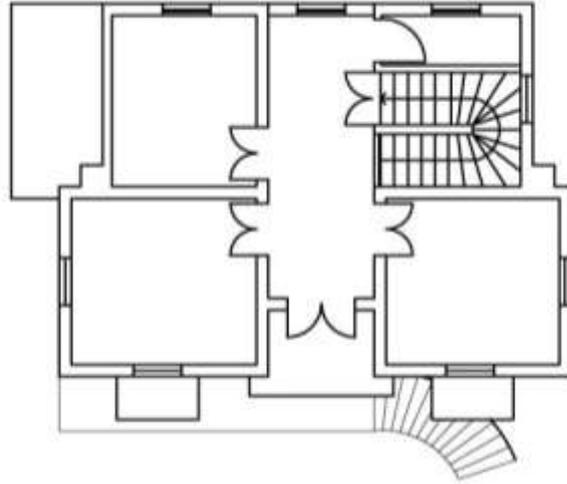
Second floor plan of the house at 147 lot 3 parcel
